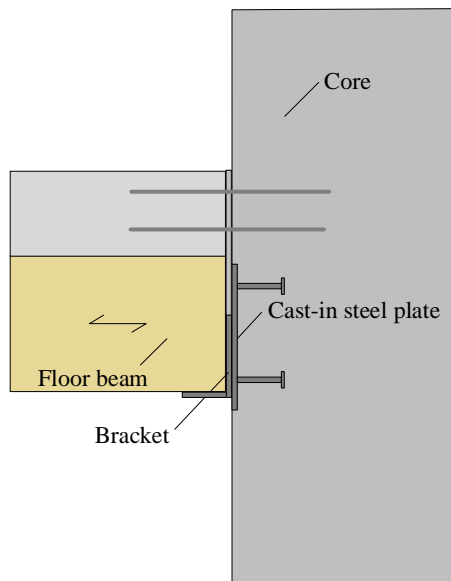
Illustration of an example of the connection between floor element and concrete core.
